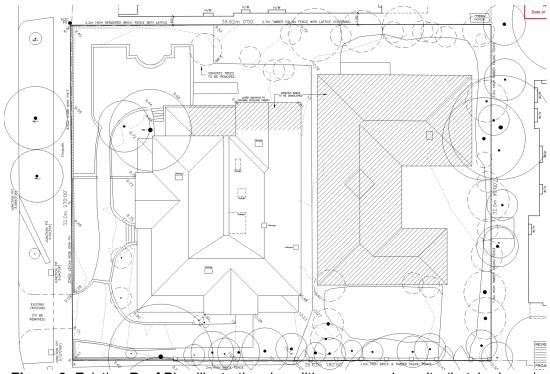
Existing Roof Plan illustrating demolition proposed on site (hatched grey).
